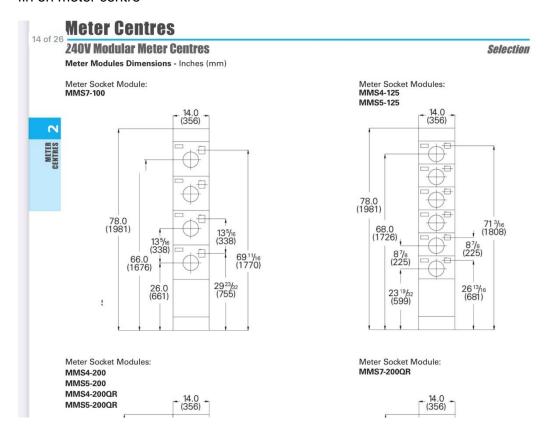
Manufactures installation specification sheet (MMS7-100 installed)
